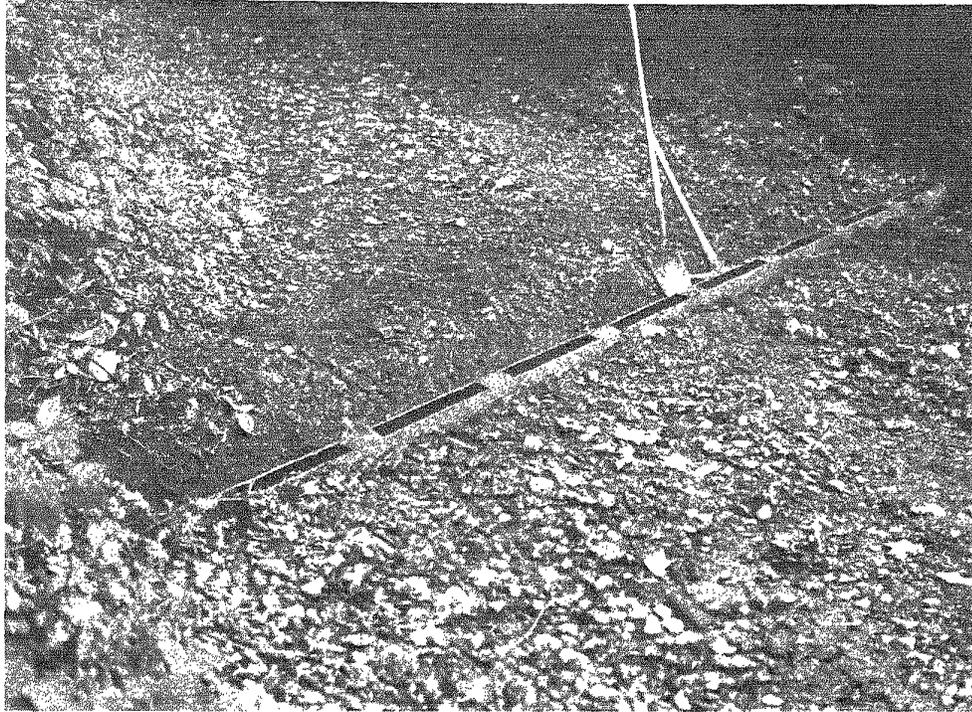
Installing open-top pipe culverts manually minimized disturbance to roadbeds. It also was easier to install culverts to the proper depth and skew by hand.
